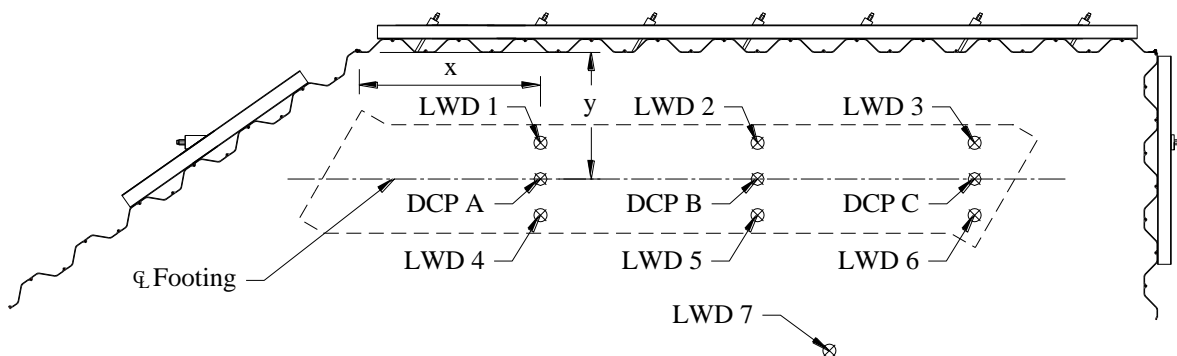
Dimensions of backfill LWD and DCP test locations (see Table 5-19) on abutments
